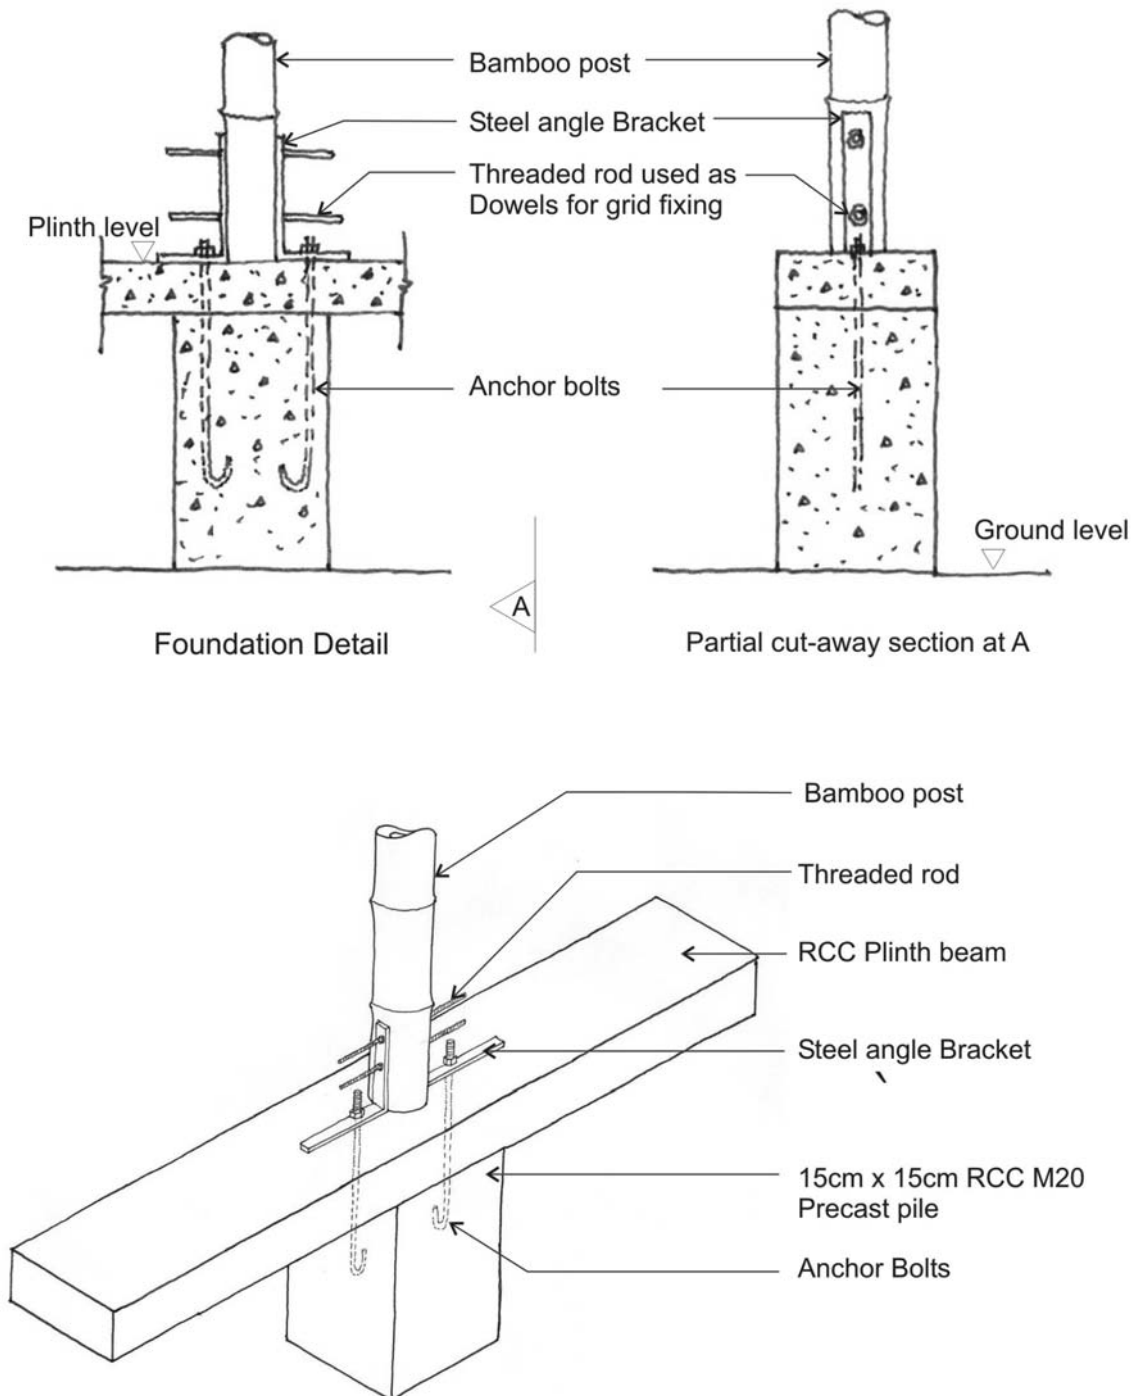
Fixing detail of bamboo to plinth using bolted connection
